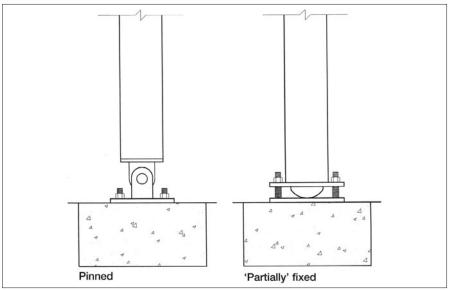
Details of portal frame base connections, pinned and 'partially' fixed
